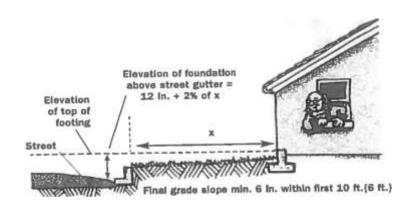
Slope grade and elevation of foundation (2015 IRC R401.3, R403.1.7.3)
